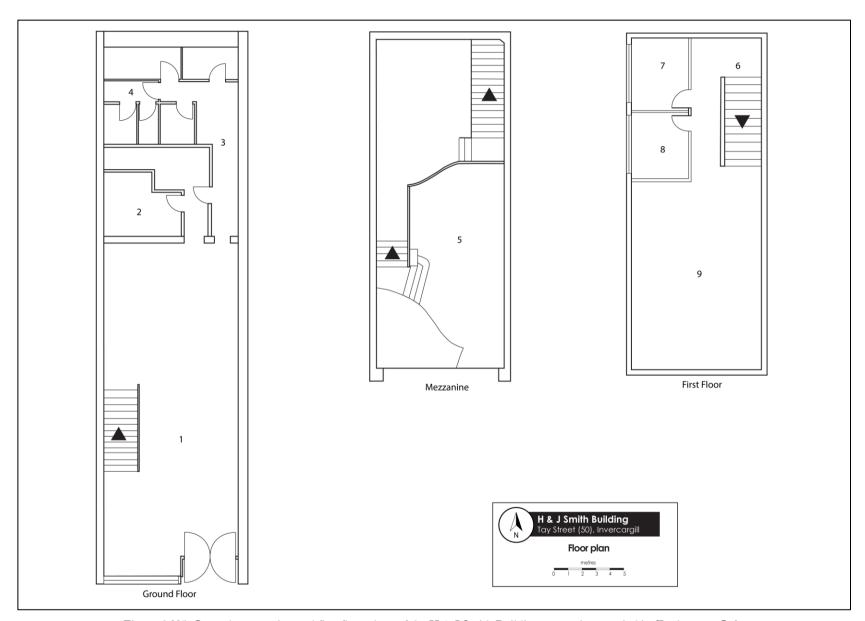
Ground, mezzanine and first floor plans of the H & J Smith Building currently occupied by Zookeepers Cafe.
